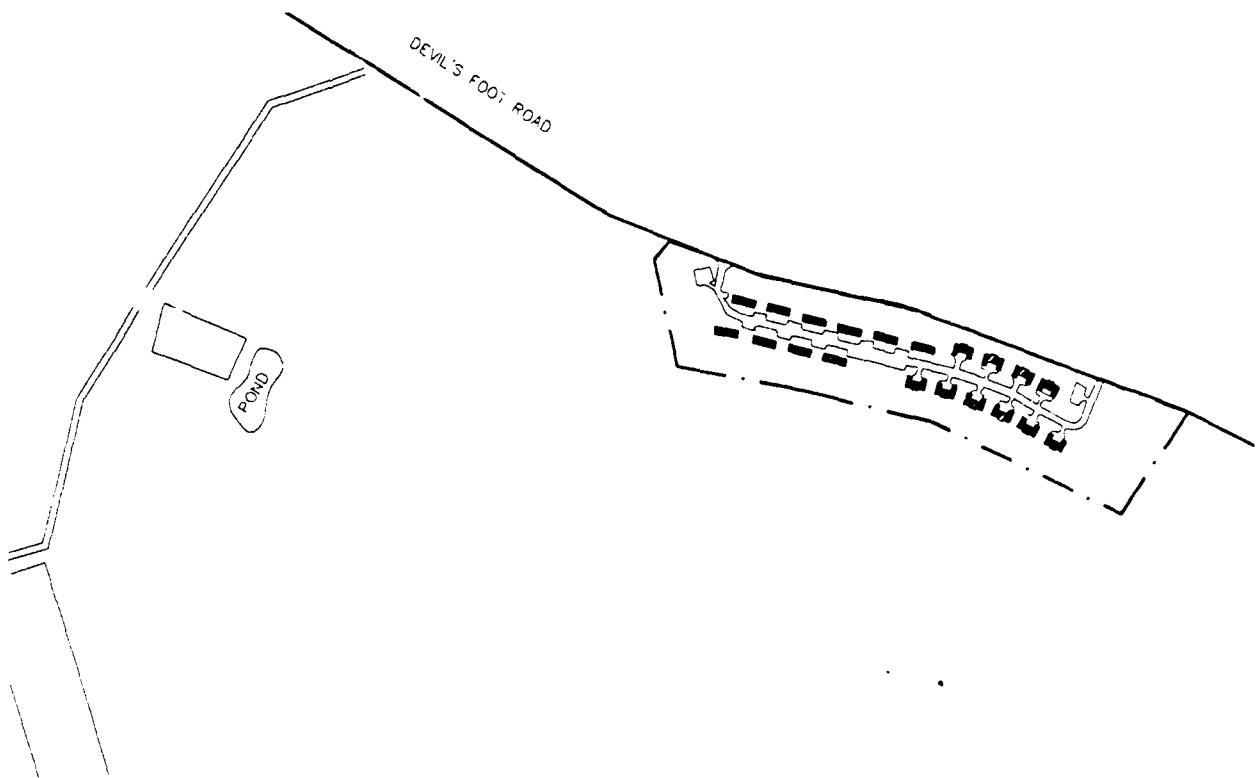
Site Plan Map of Davisville Army Housing Units
